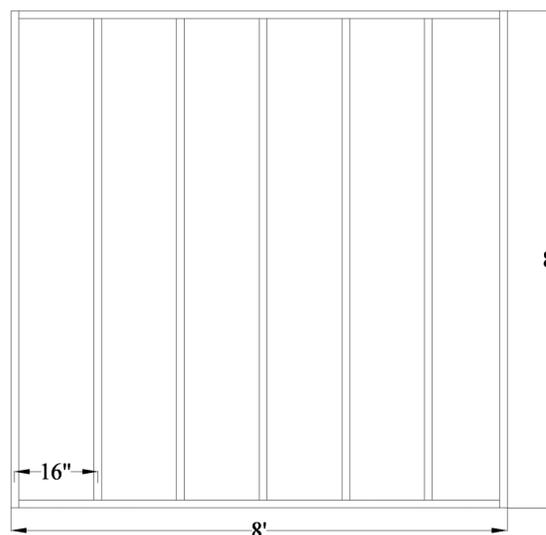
Schematic of an 8 × 8 ft (2.44 × 2.44 m) test wall with 16 in. spacing.
